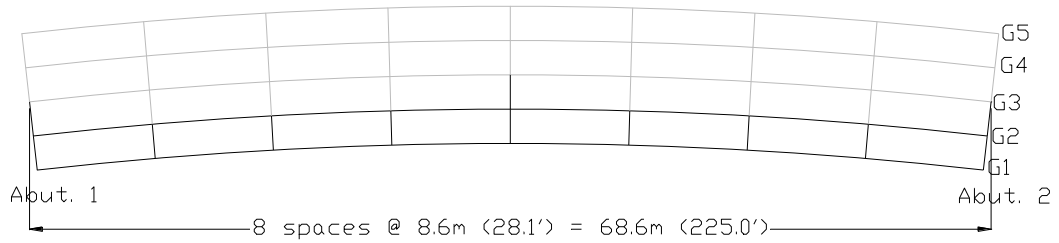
Stage 1 of Construction for Paired Girder (Inner Girders Placed First) Erection of Single-Span, 5-Girder, 305-m (1000-ft) Radius Bridge.
